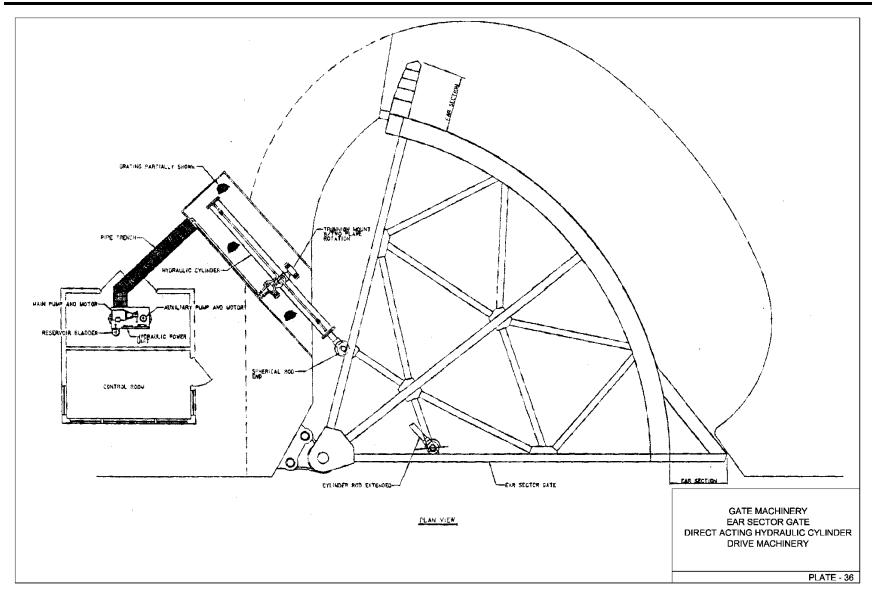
Plate 36: Gate machinery, ear sector gate, direct acting hydraulic cylinder drive machinery
